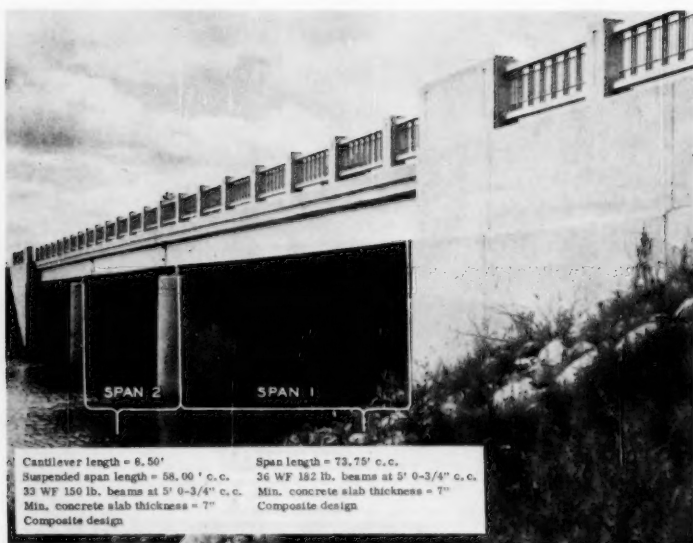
Bridge B2 of 73-20-2. On routes M-46 and M-47 west of Saginaw. Rolled beam cantilever-type bridge.
